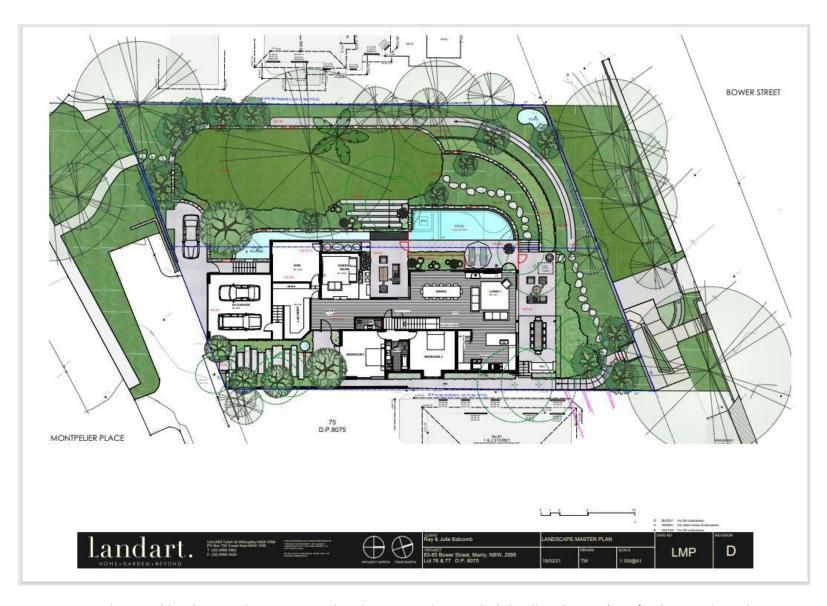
Proposed revised landscape plan associated with proposed amended dwelling house (see final revised Landscape Concept Plan by Landart 2021)
